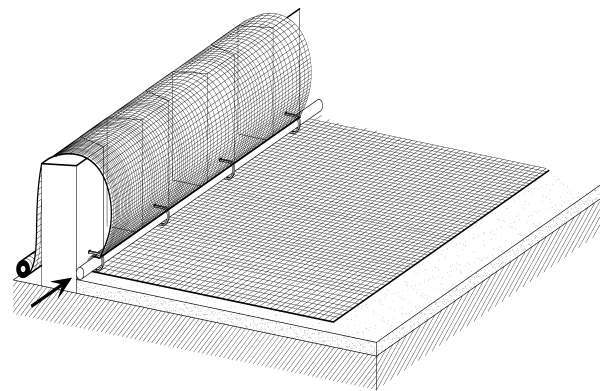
Connection detail – a steel pipe is pushed through the rings to connect the geogrid with the sheet pile wall
